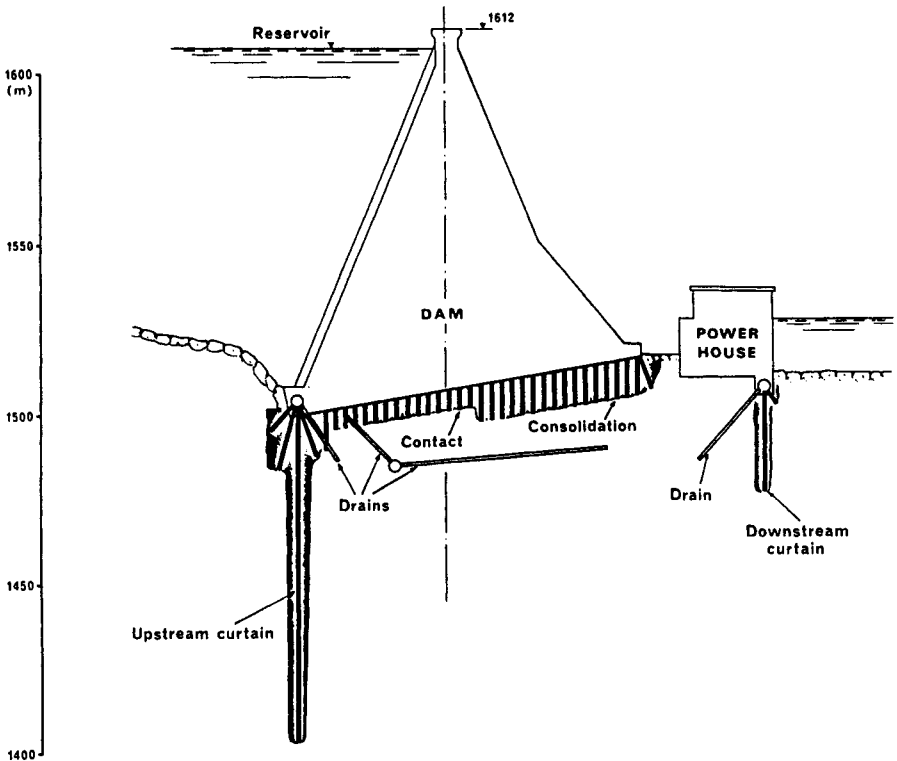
Typical cross section, Farahnaz Pahlavi dam, Iran.
